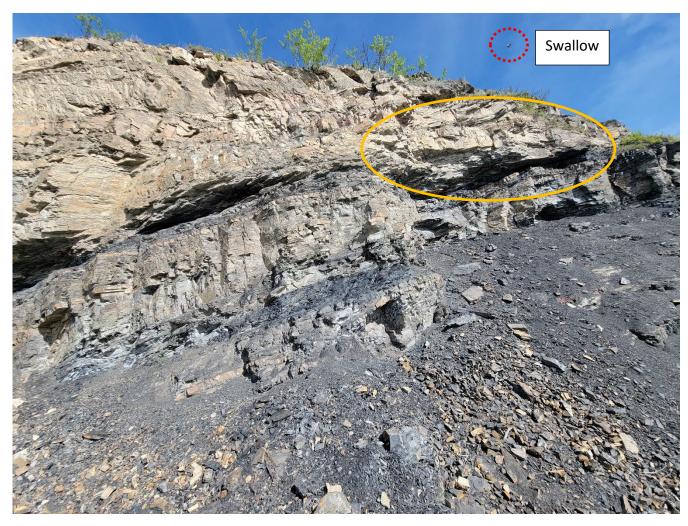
Rock slope north of highway. Photo taken facing northeast on May 27, 2025.
